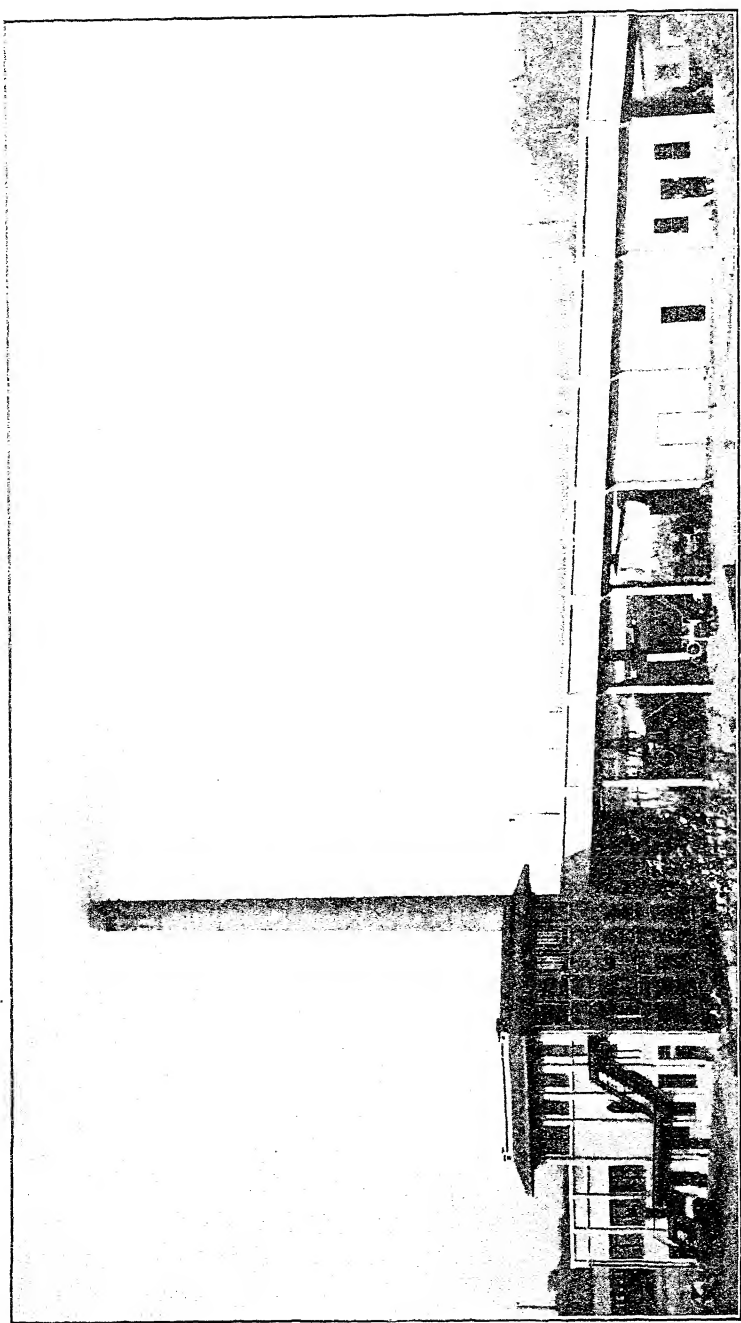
West New Brighton (N. Y.) Destructor Works, view of approach roadway, buildings and chimney.
